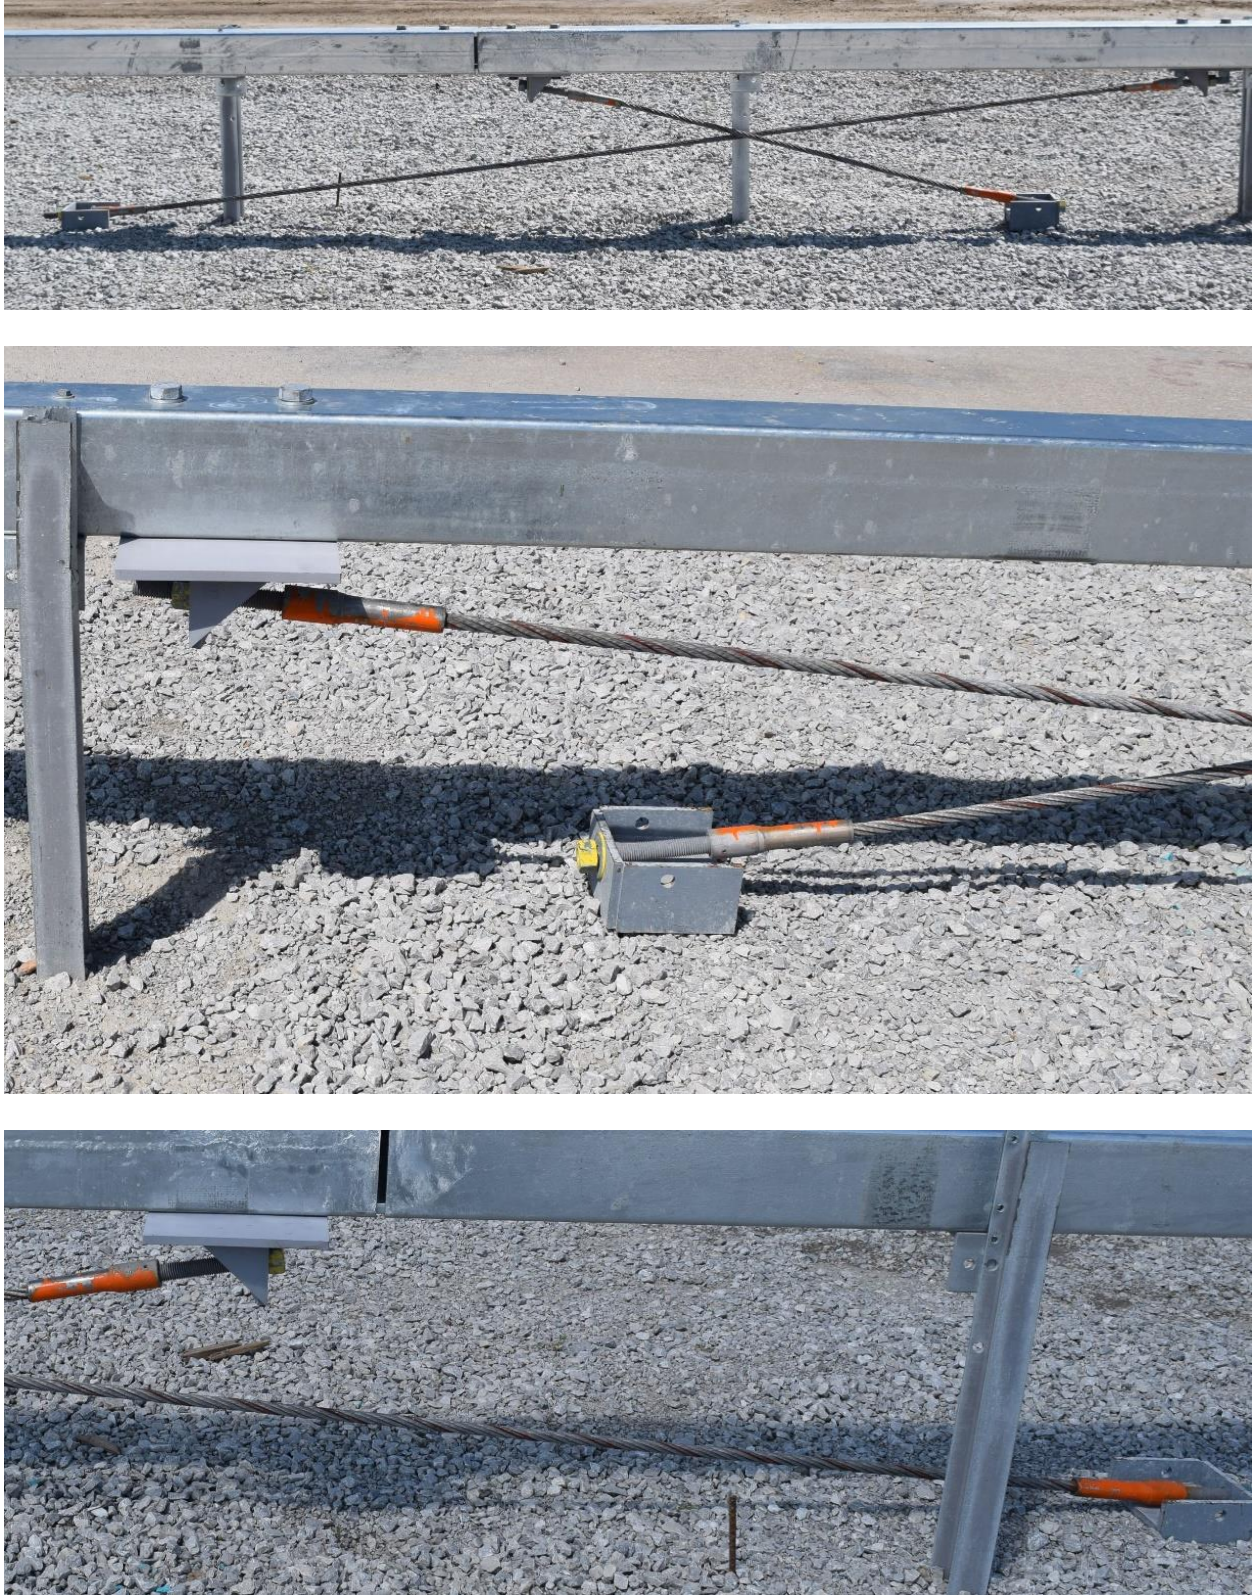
Test Installation, Upstream Anchor Details, Test No. NYT-1
